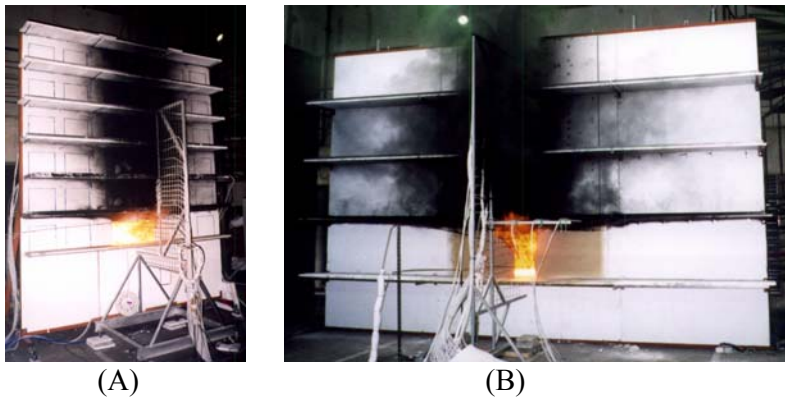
Reduced-scale model buildings used in the research. (A) 1/7-scale model building with one opening. (B) 1/3-scale model building.
